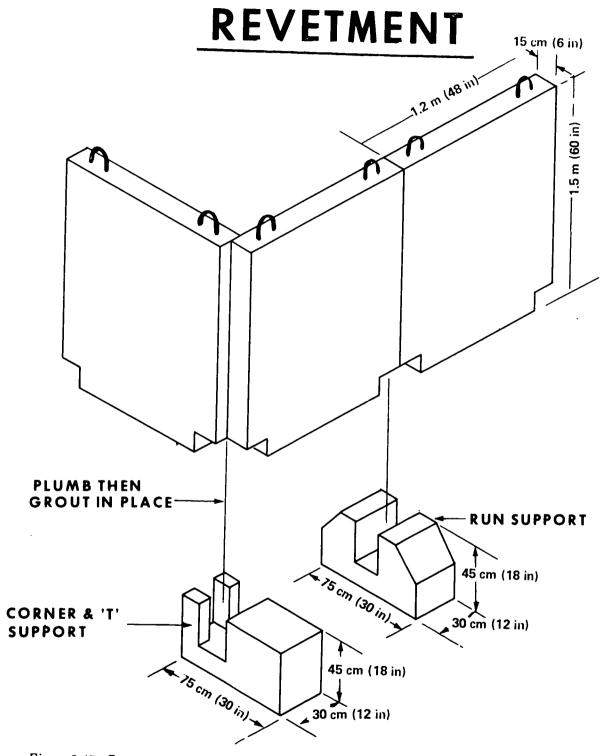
Precast concrete revetment (relocatable 1.5 to 2.9m (5 to 9.5 ft) high sections).
